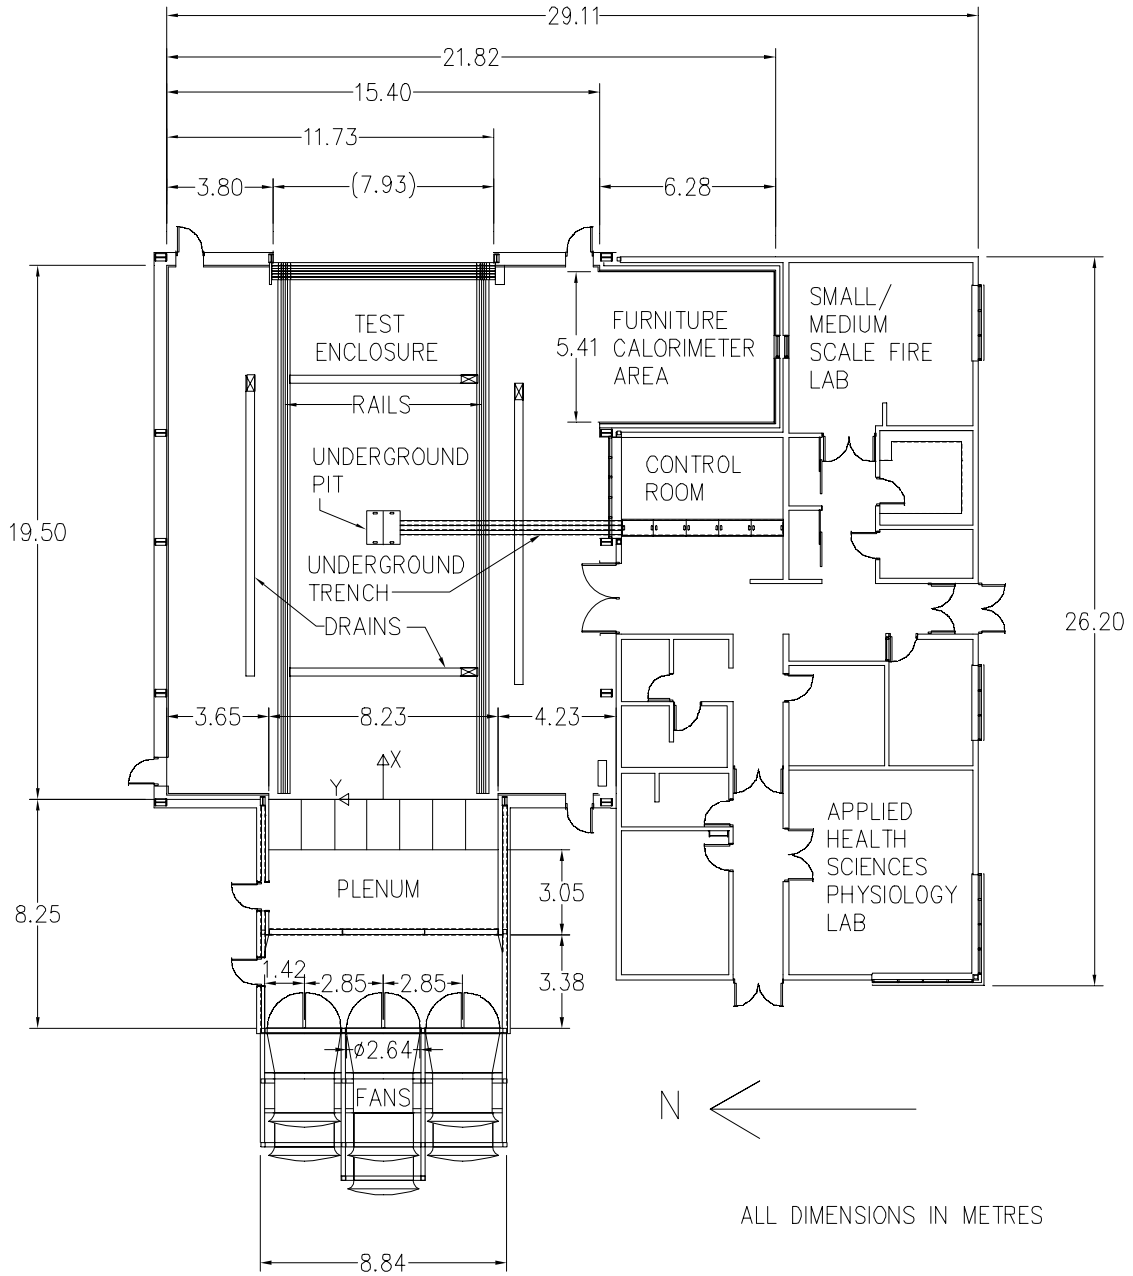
University of Waterloo Live Fire Research Facility, floor plan
